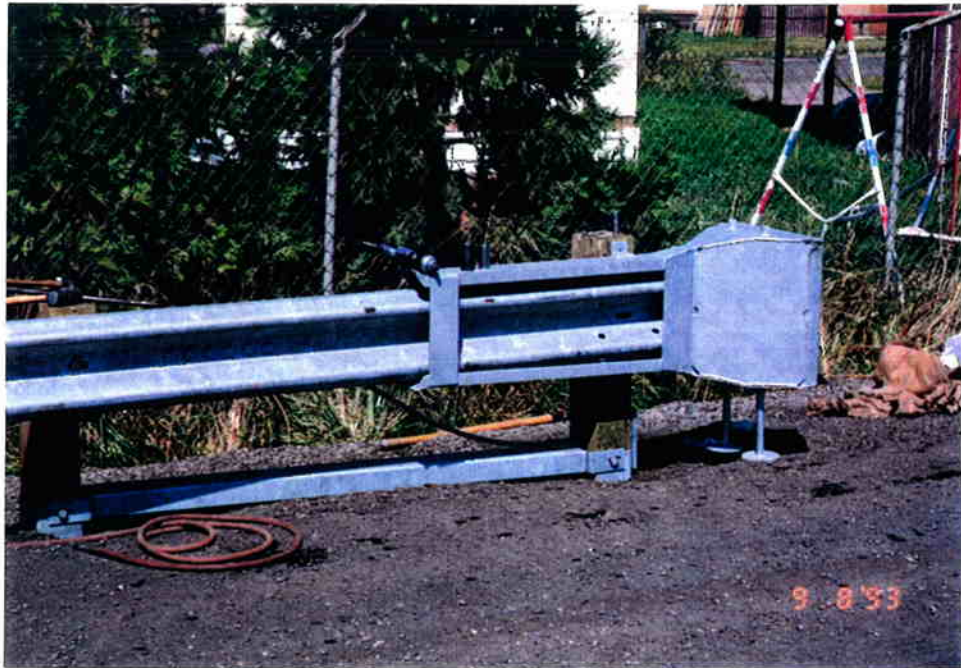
ET-2000 Guardrail Extruder Head, Offset Strut, and Cable Assembly Installation.
